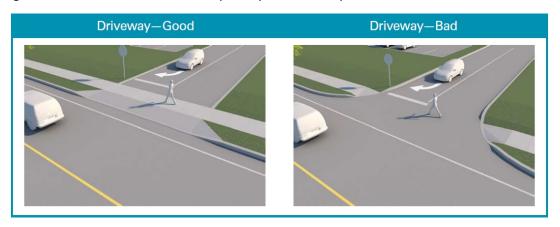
Sidewalk and Driveways (Source: CSDG)
